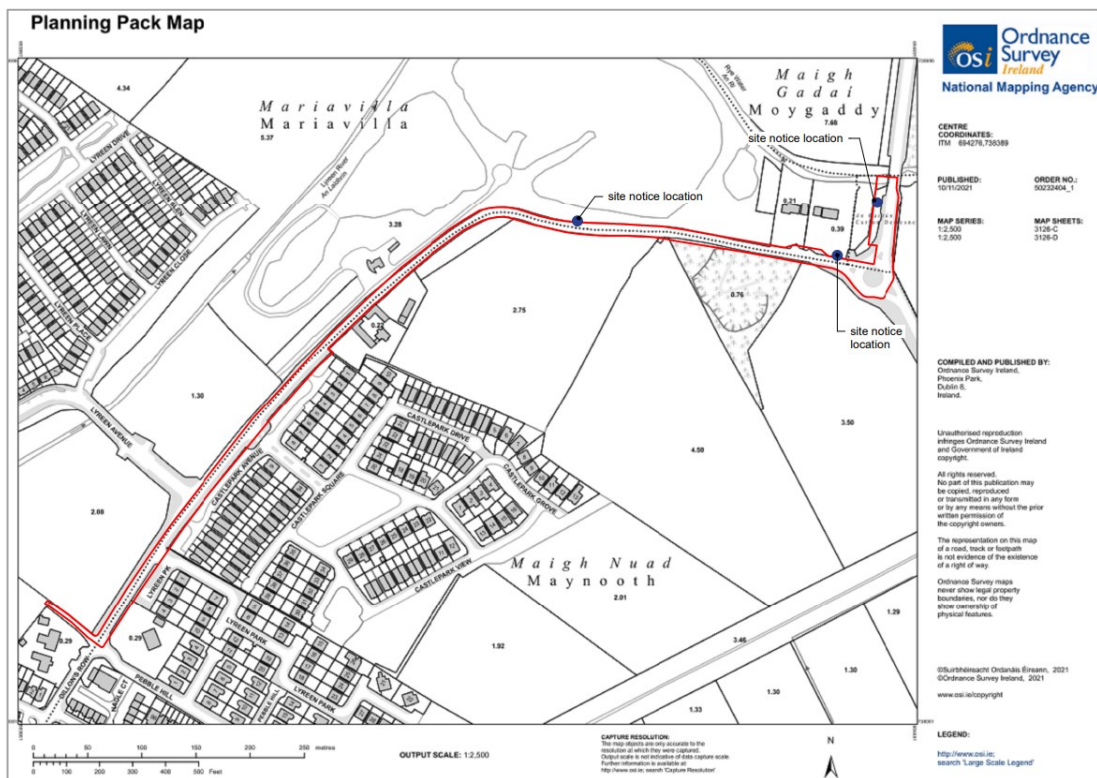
Site Location Plan – Kildare Bridge Works. Source: Crawford Architecture
